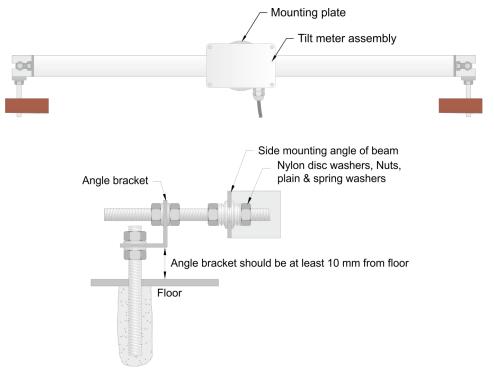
Installation of EAN-91M-B sensor horizontally on the floor
